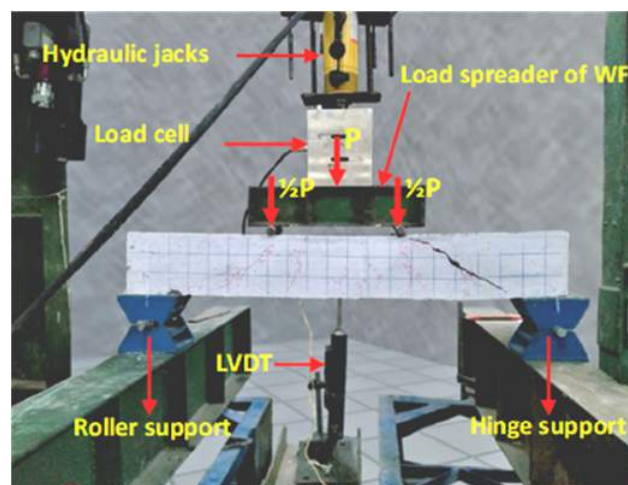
Test arrangement of bamboo-reinforced concrete beams.
